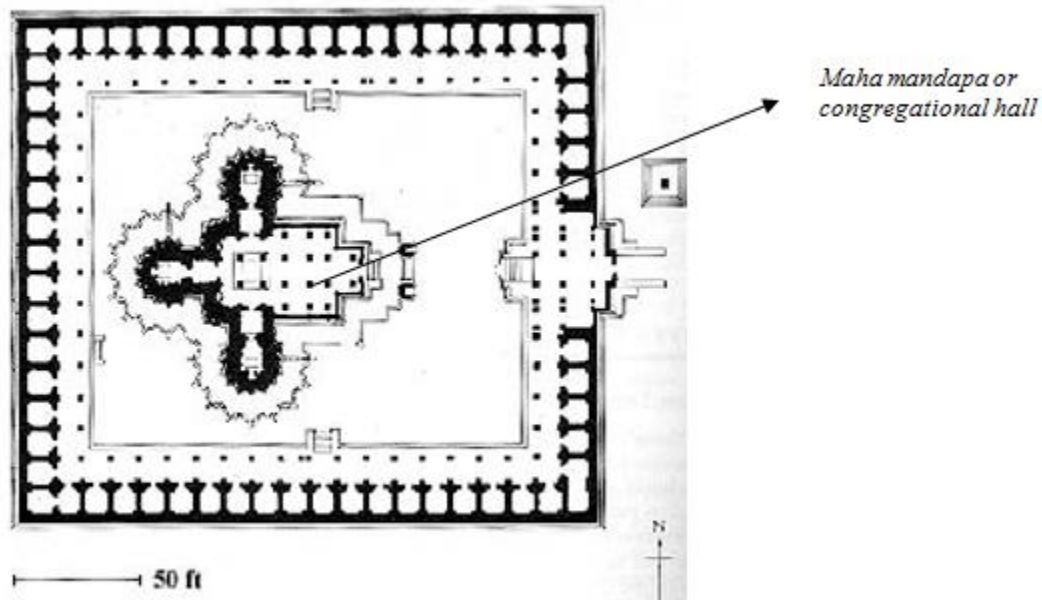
Plan of a typical Vesara style temple of Keshava in Somnathpur (12th C).
